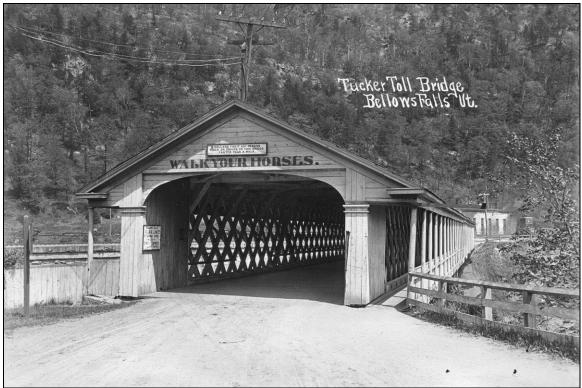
Tucher Bridge, Bellows Falls end, shown sometime after 1902. Sign above portal reads: "2 dollars fine if any person rides or drives on this bridge faster than a walk." Sign on wall reads "Bellows Falls Village Limits Automobile Laws will be Strictly Enforced (Cheshire County Historical Society).
